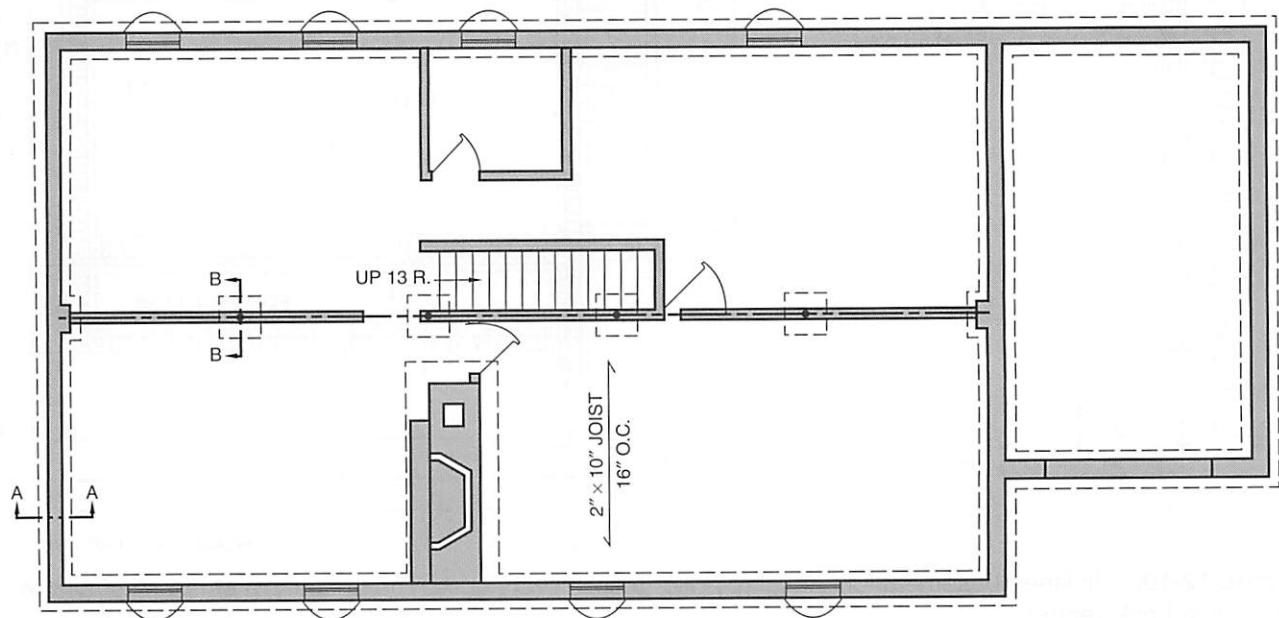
Interior basement walls and doors, windows, joint information, stairs, and section symbols have been added to the partially completed plan.
